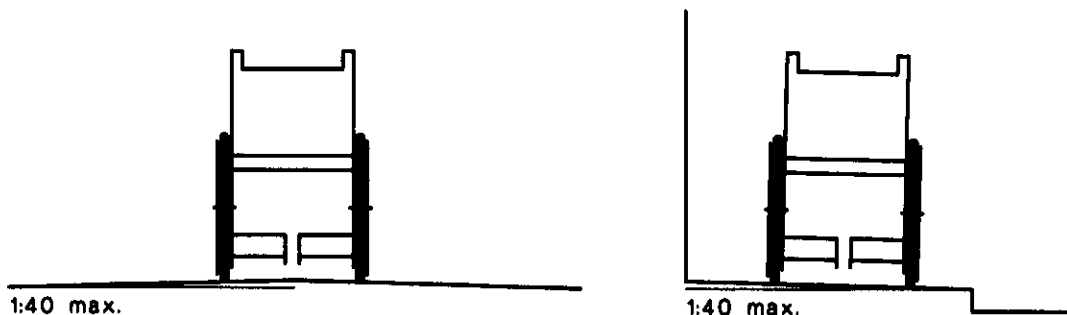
MAXIMUM ALLOWABLE CAMBER AND CROSSFALL FOR RAMPS AND WALKWAYS
